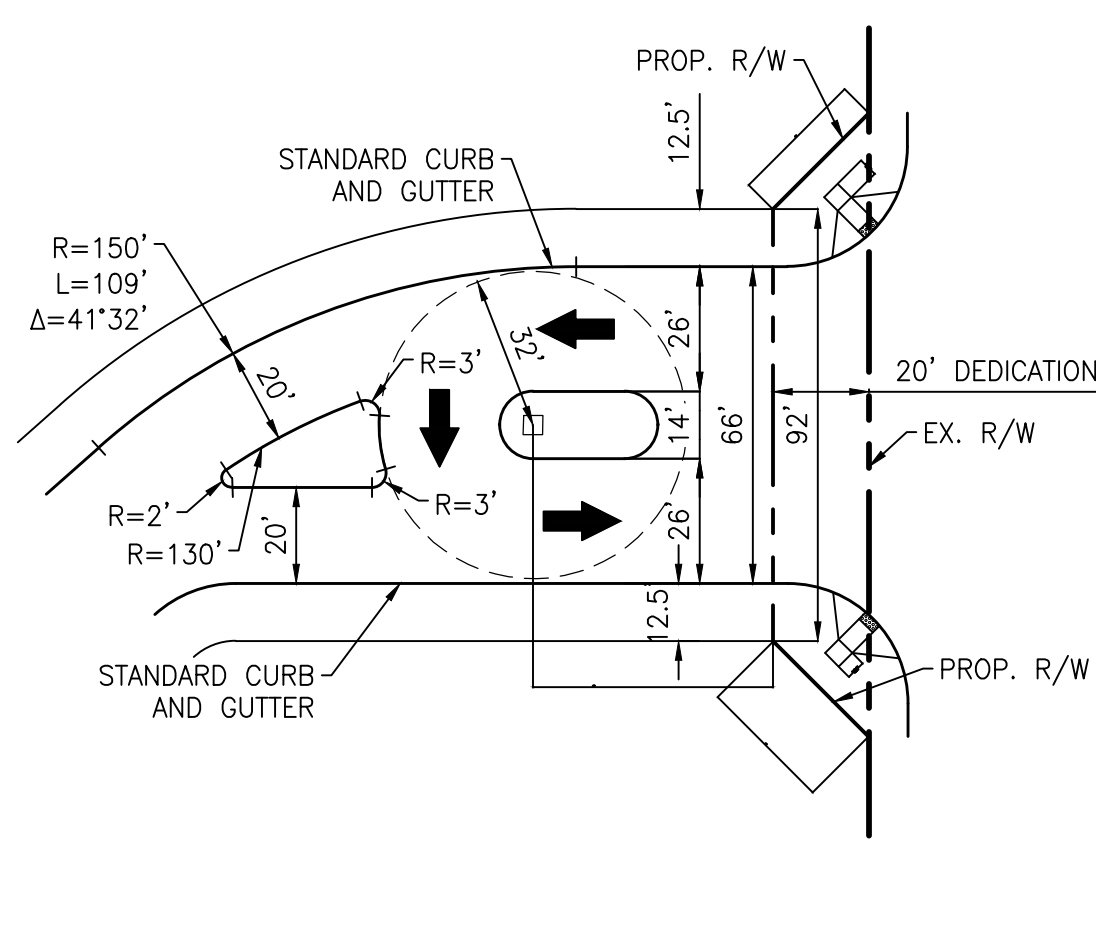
TYPICAL PRIVATE STREET CUL-DE-SAC
